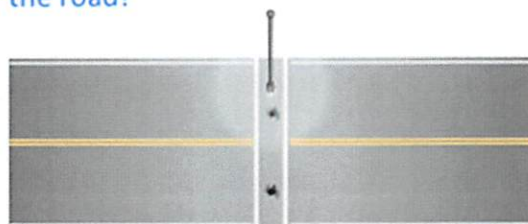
Drawing. Traditional midblock crosswalk lighting layout.
